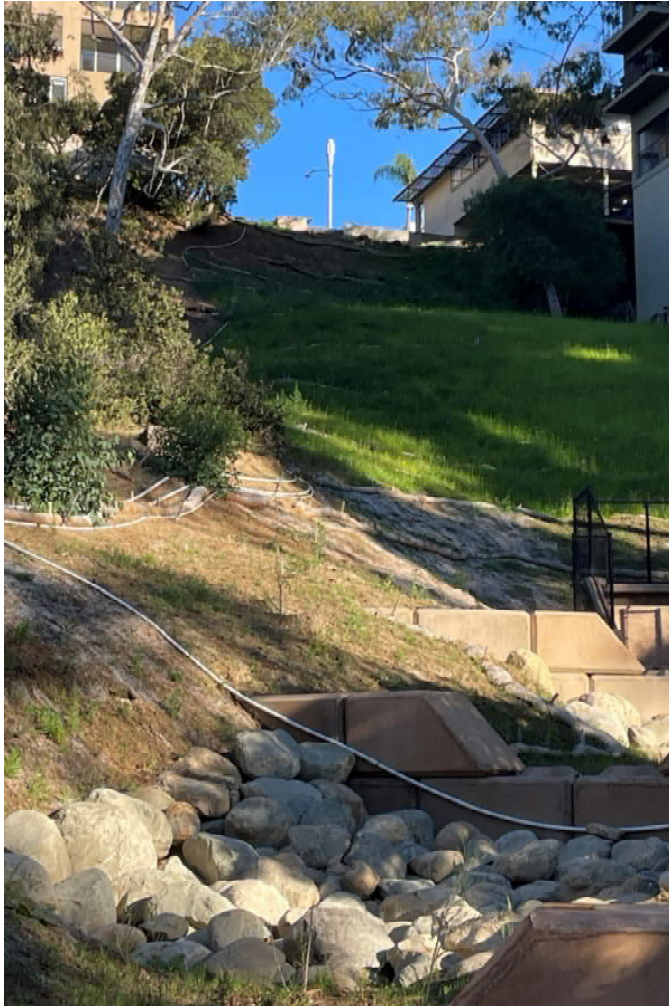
2660 First Ave, Northwest Corner from Maple Canyon Trail (October 2025)
